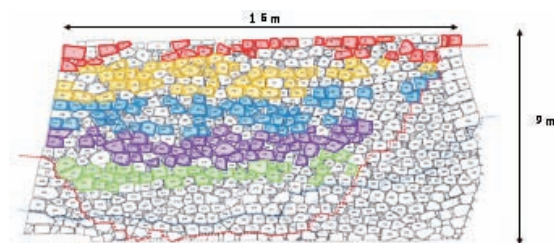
An elevation diagram of the Miyauchi dry stone wall
